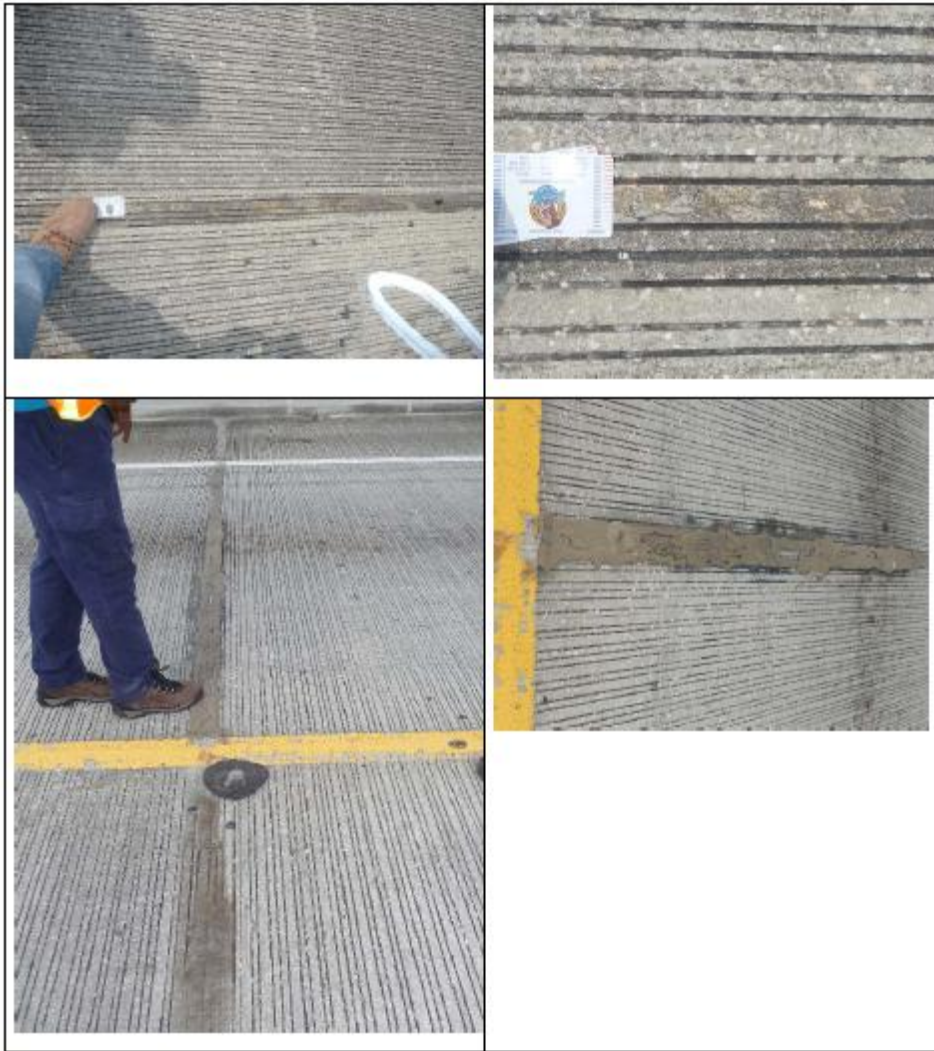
Bridge Deck Cracking on Bridge 860526
